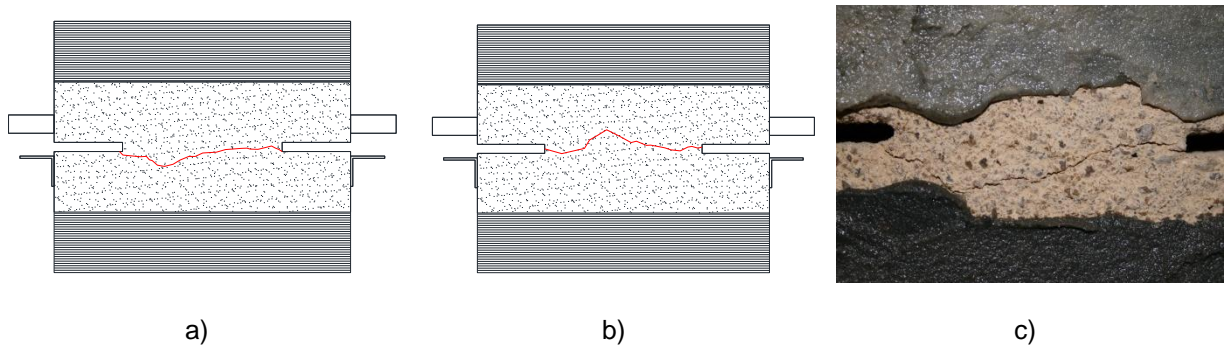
Crack development of tested adobe specimen (T_S_04); a) front face; b) back face; c) detail of crack path.
